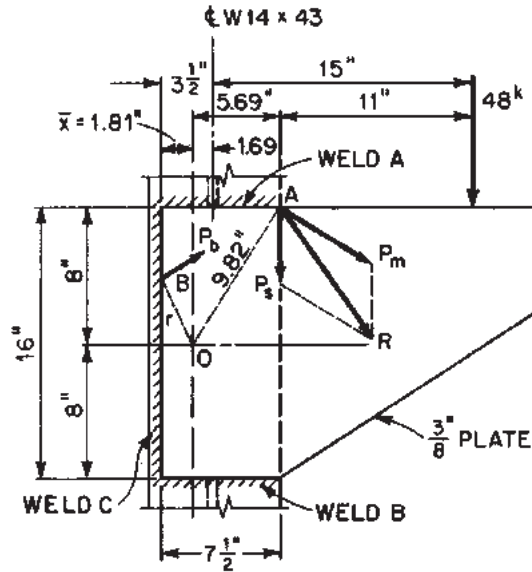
Bracket with fillet welds in shear.
